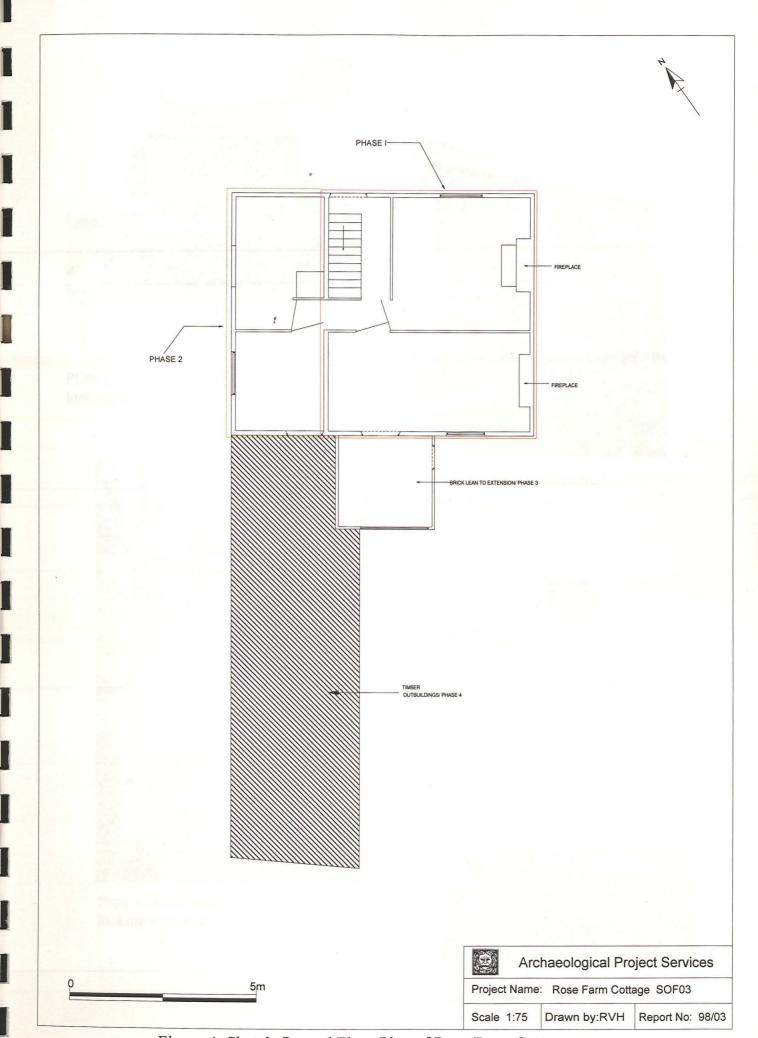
Sketch Ground Floor Plan of Rose Farm Cottage
